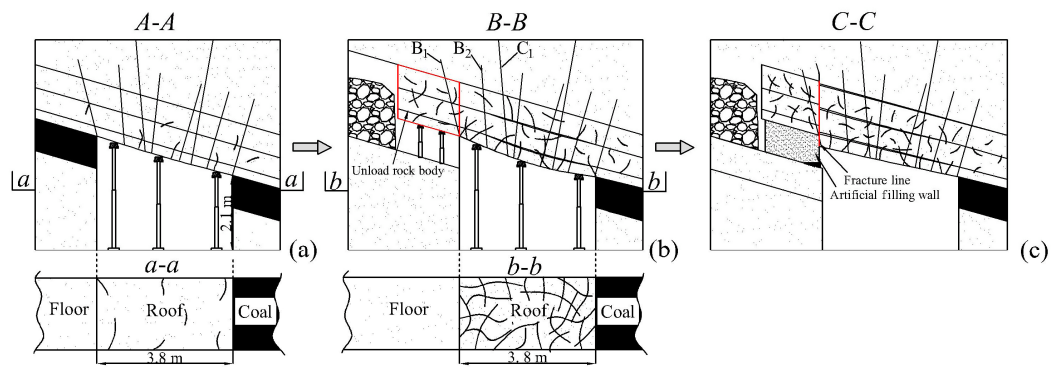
Schematic of soft roof rock mass failure; (a) In front abutment pressure zone; (b) In working face end; (c) In stress stability zone of retaining gateway.
